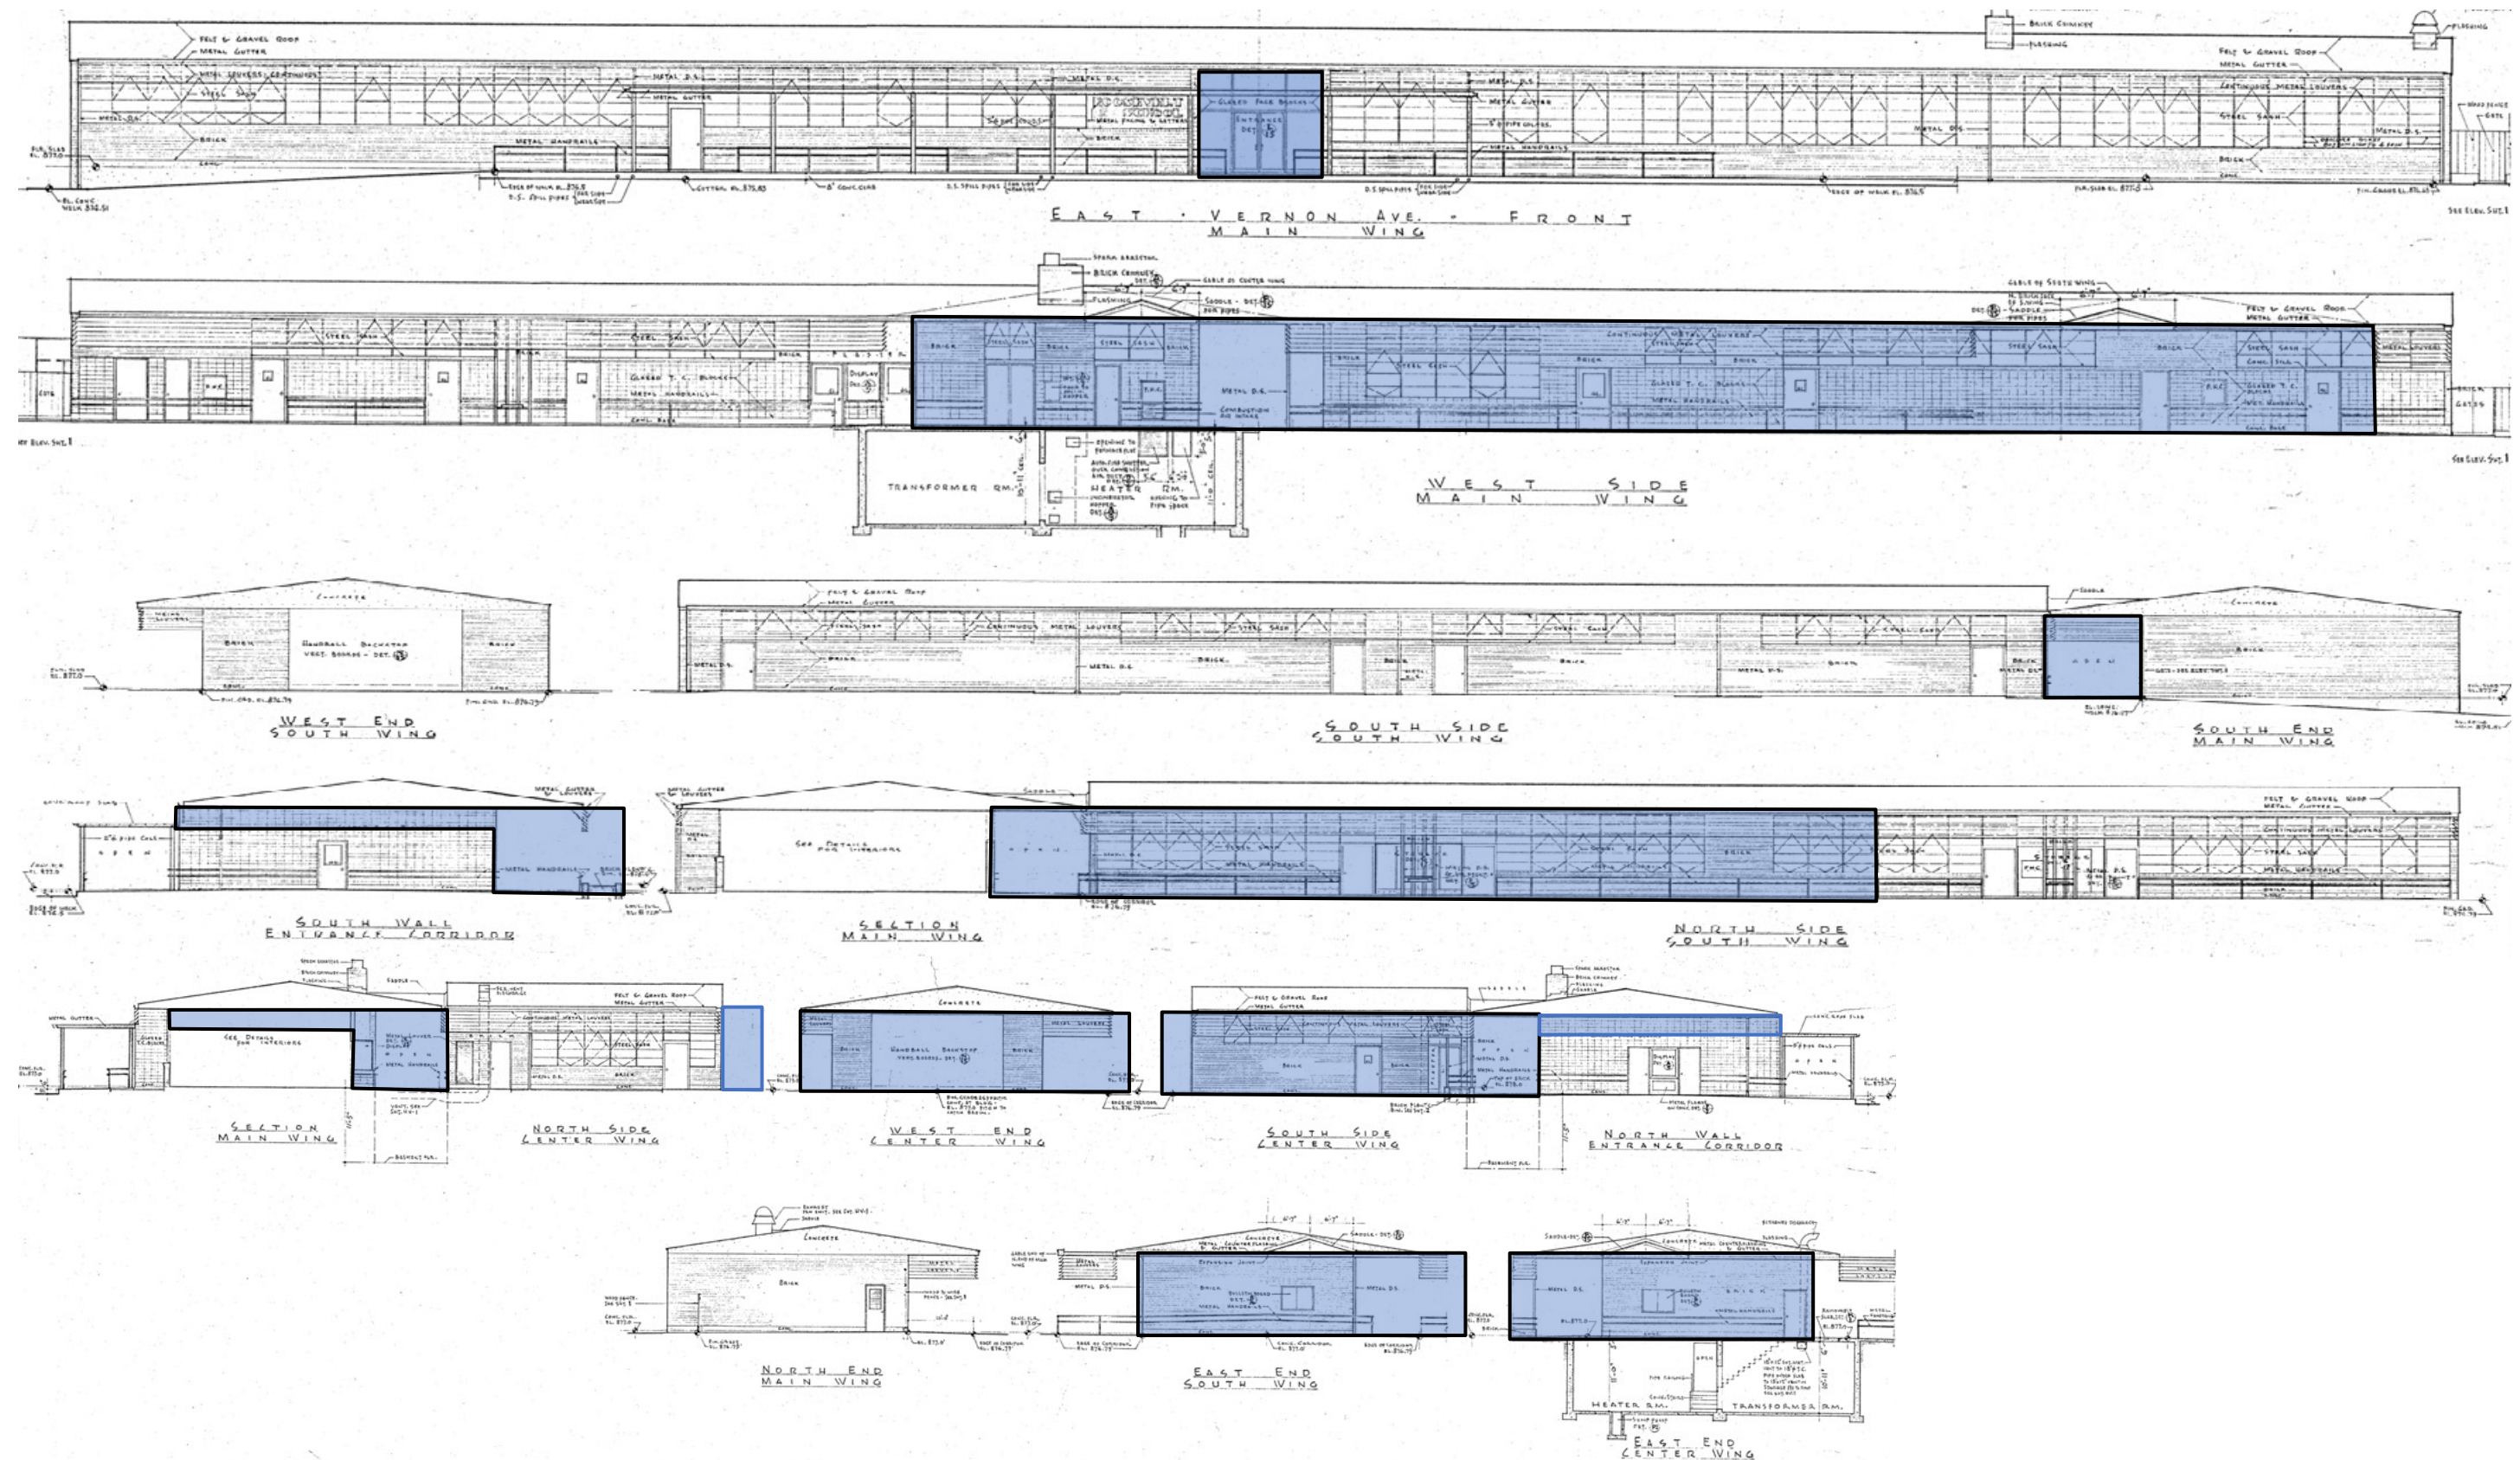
1953 EXTERIOR BUILDING ELEVATIONS ILLUSTRATING THE EXTENT OF ADDITIONS (IN BLUE)
